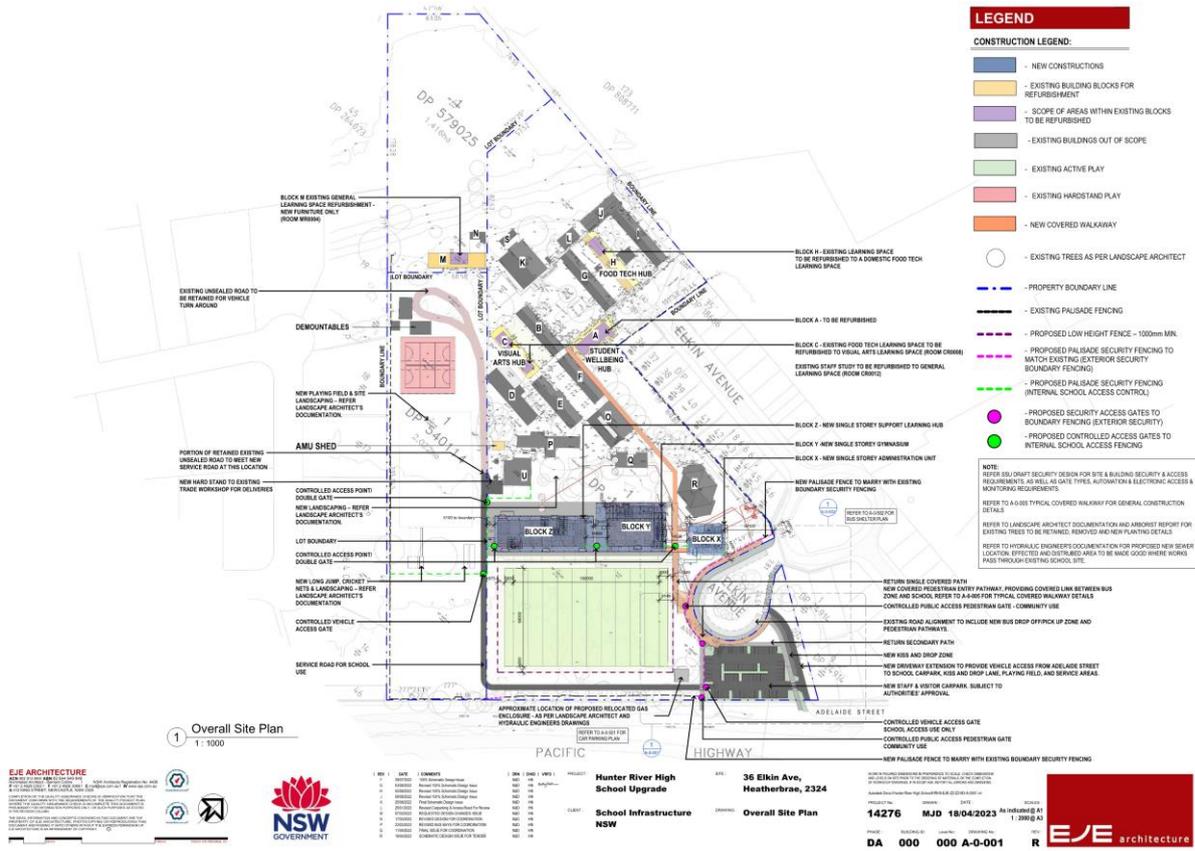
Proposed development architectural layout (Source: EJE Architecture).
